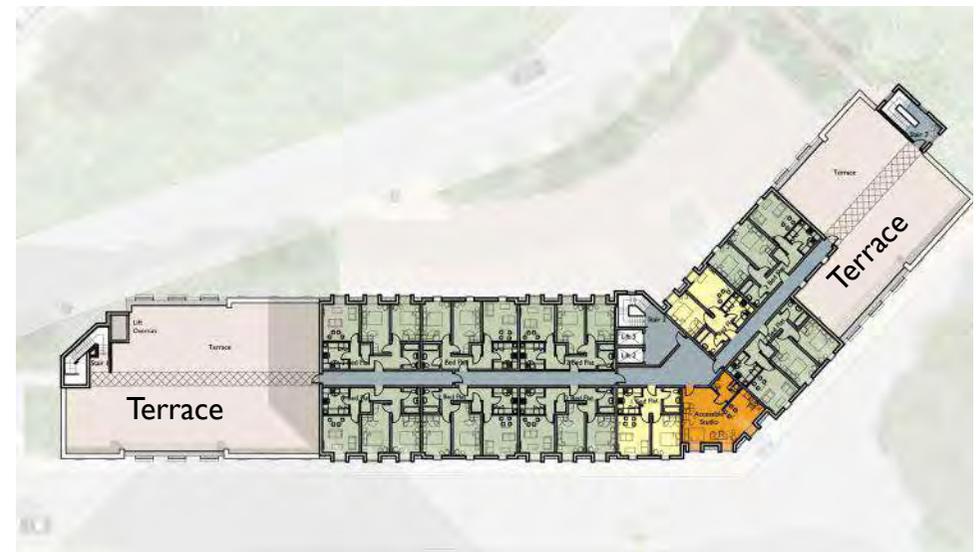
Part of Level 8 showing the Level 7 roof is paved to provide external open space
